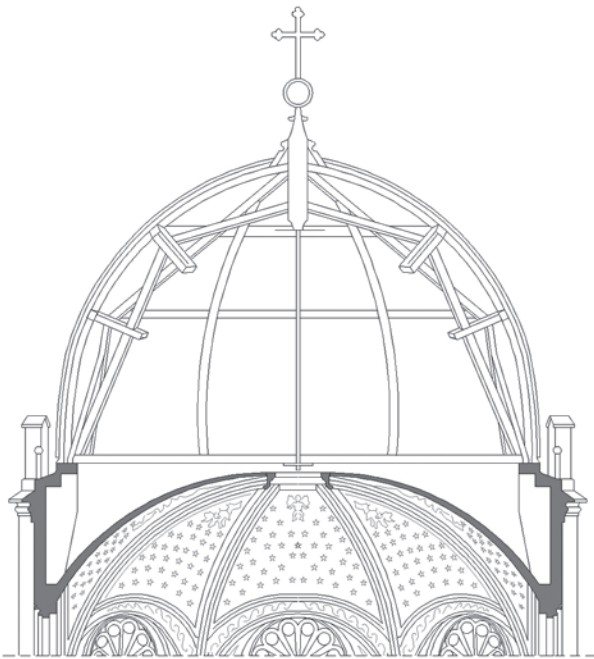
Stüler's Dome in Berlin acc. to [6]
